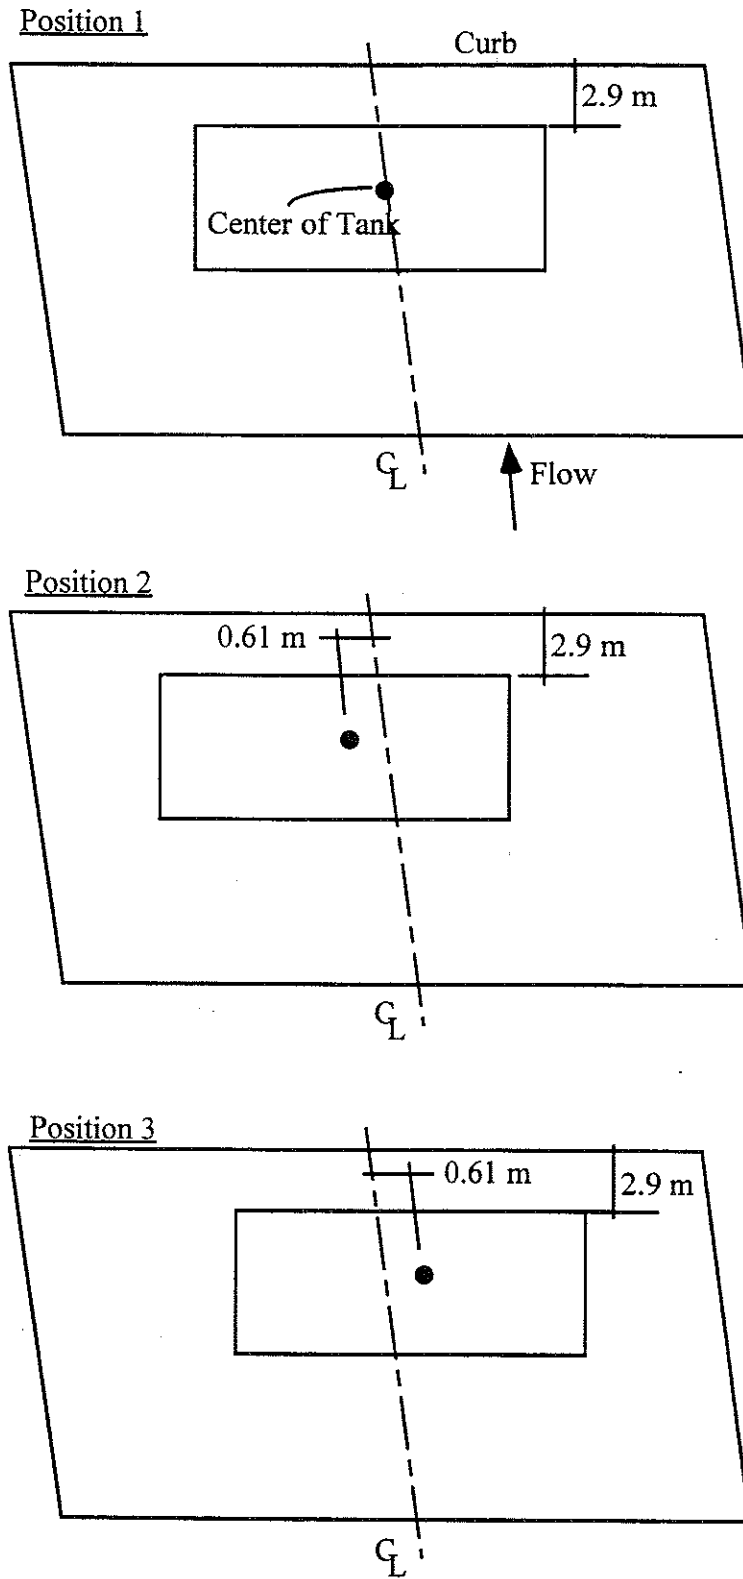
Proof Load, North Lane Loading, Center of Lane.
